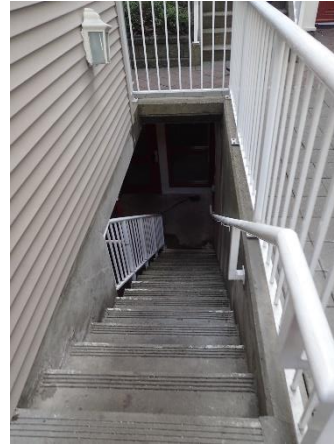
Noticeable cracks observed in slab on grade around the drainage that need to be repaired.
